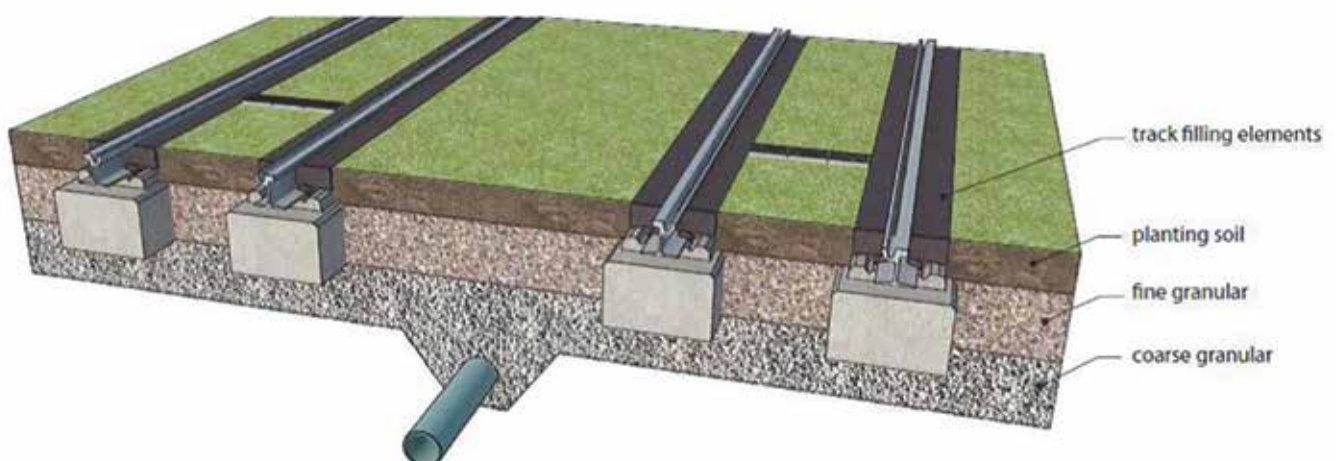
Cross-section of a parallel grade beam track. (Image source: Sydney Light Rail)
